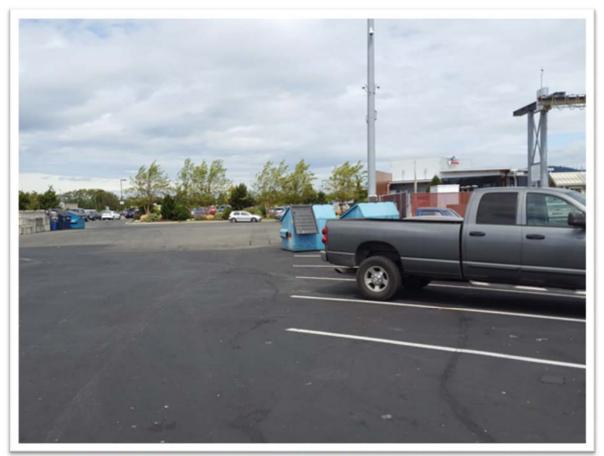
Protective asphalt barrier looking north (see Figure 1).
